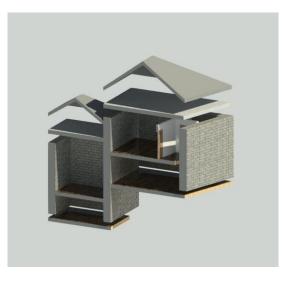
Beqiri, A. (2024) Lluke Zanati House 3D Section
